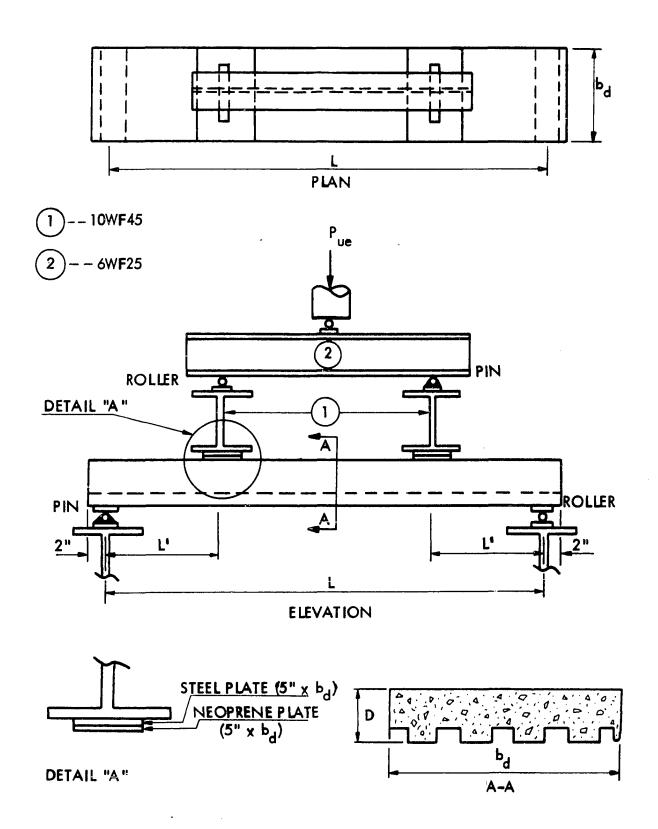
Typical composite steel-deck-reinforced beam test setup
